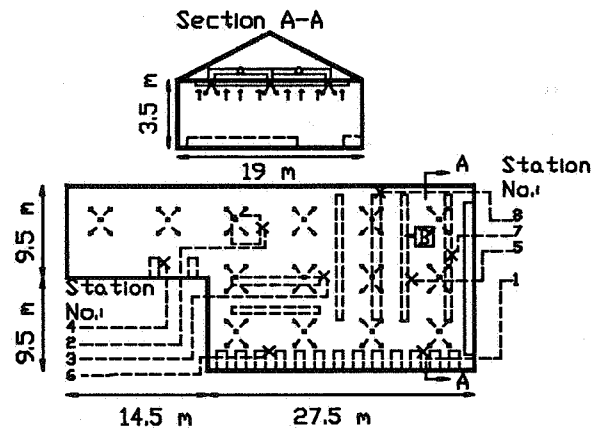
Layout and cross-section of the plant designed for MIXVENT (not to scale)
